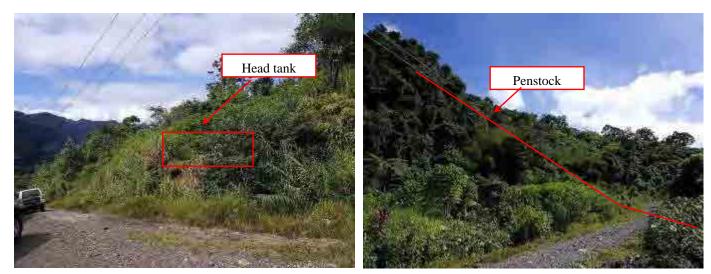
Condition of alternative head tank (View from the access road to Rewasau village))
